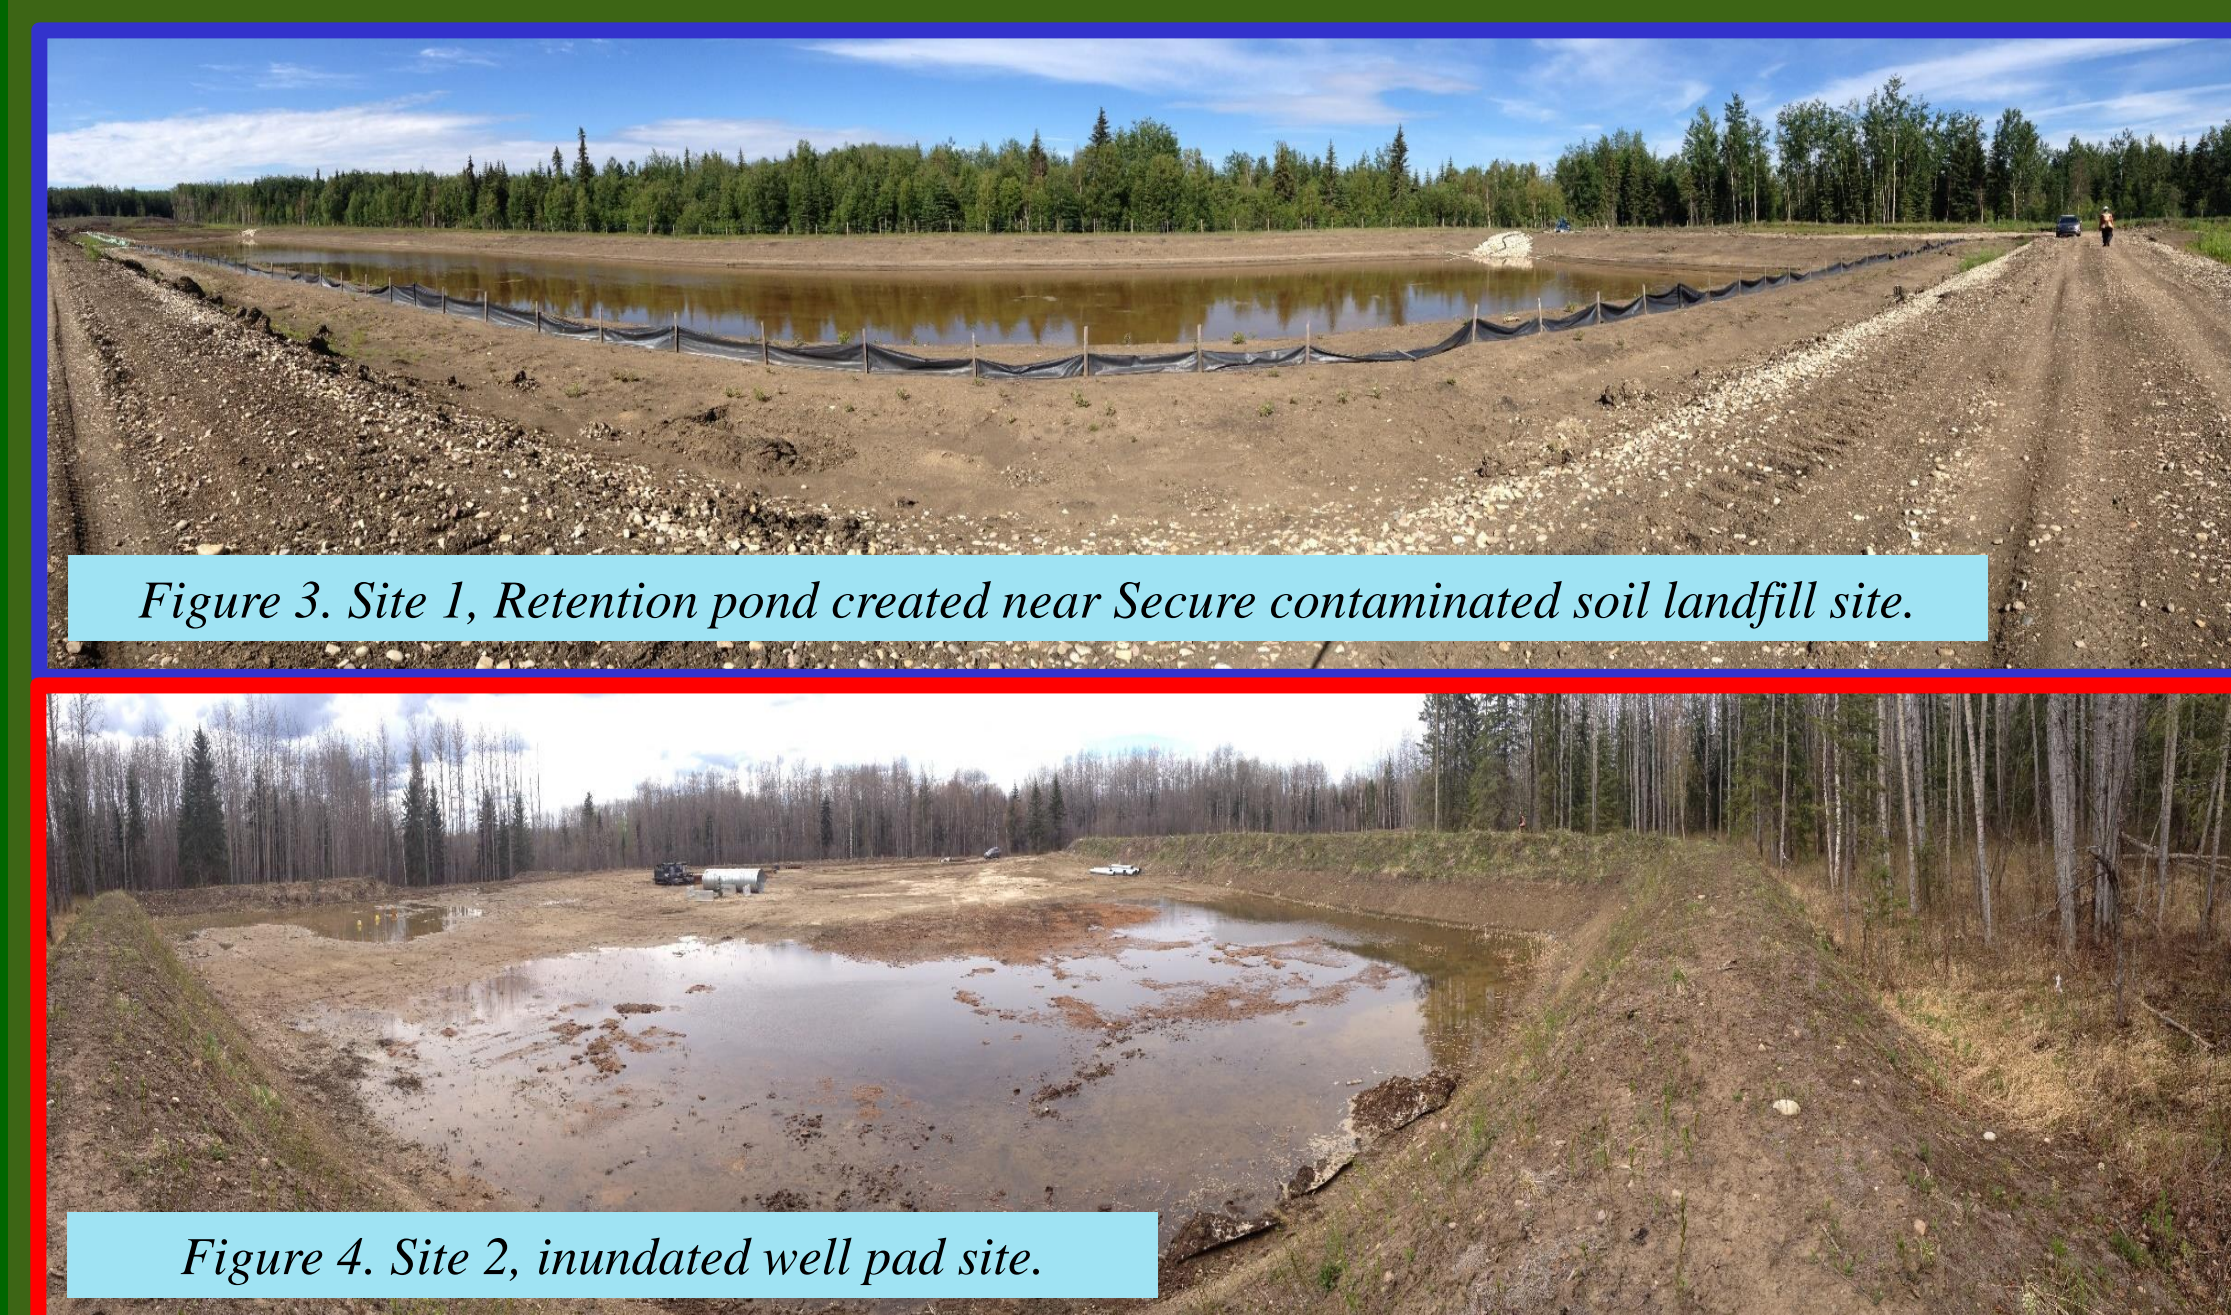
Site 1, Retention pond created near Secure contaminated soil landfill site.
